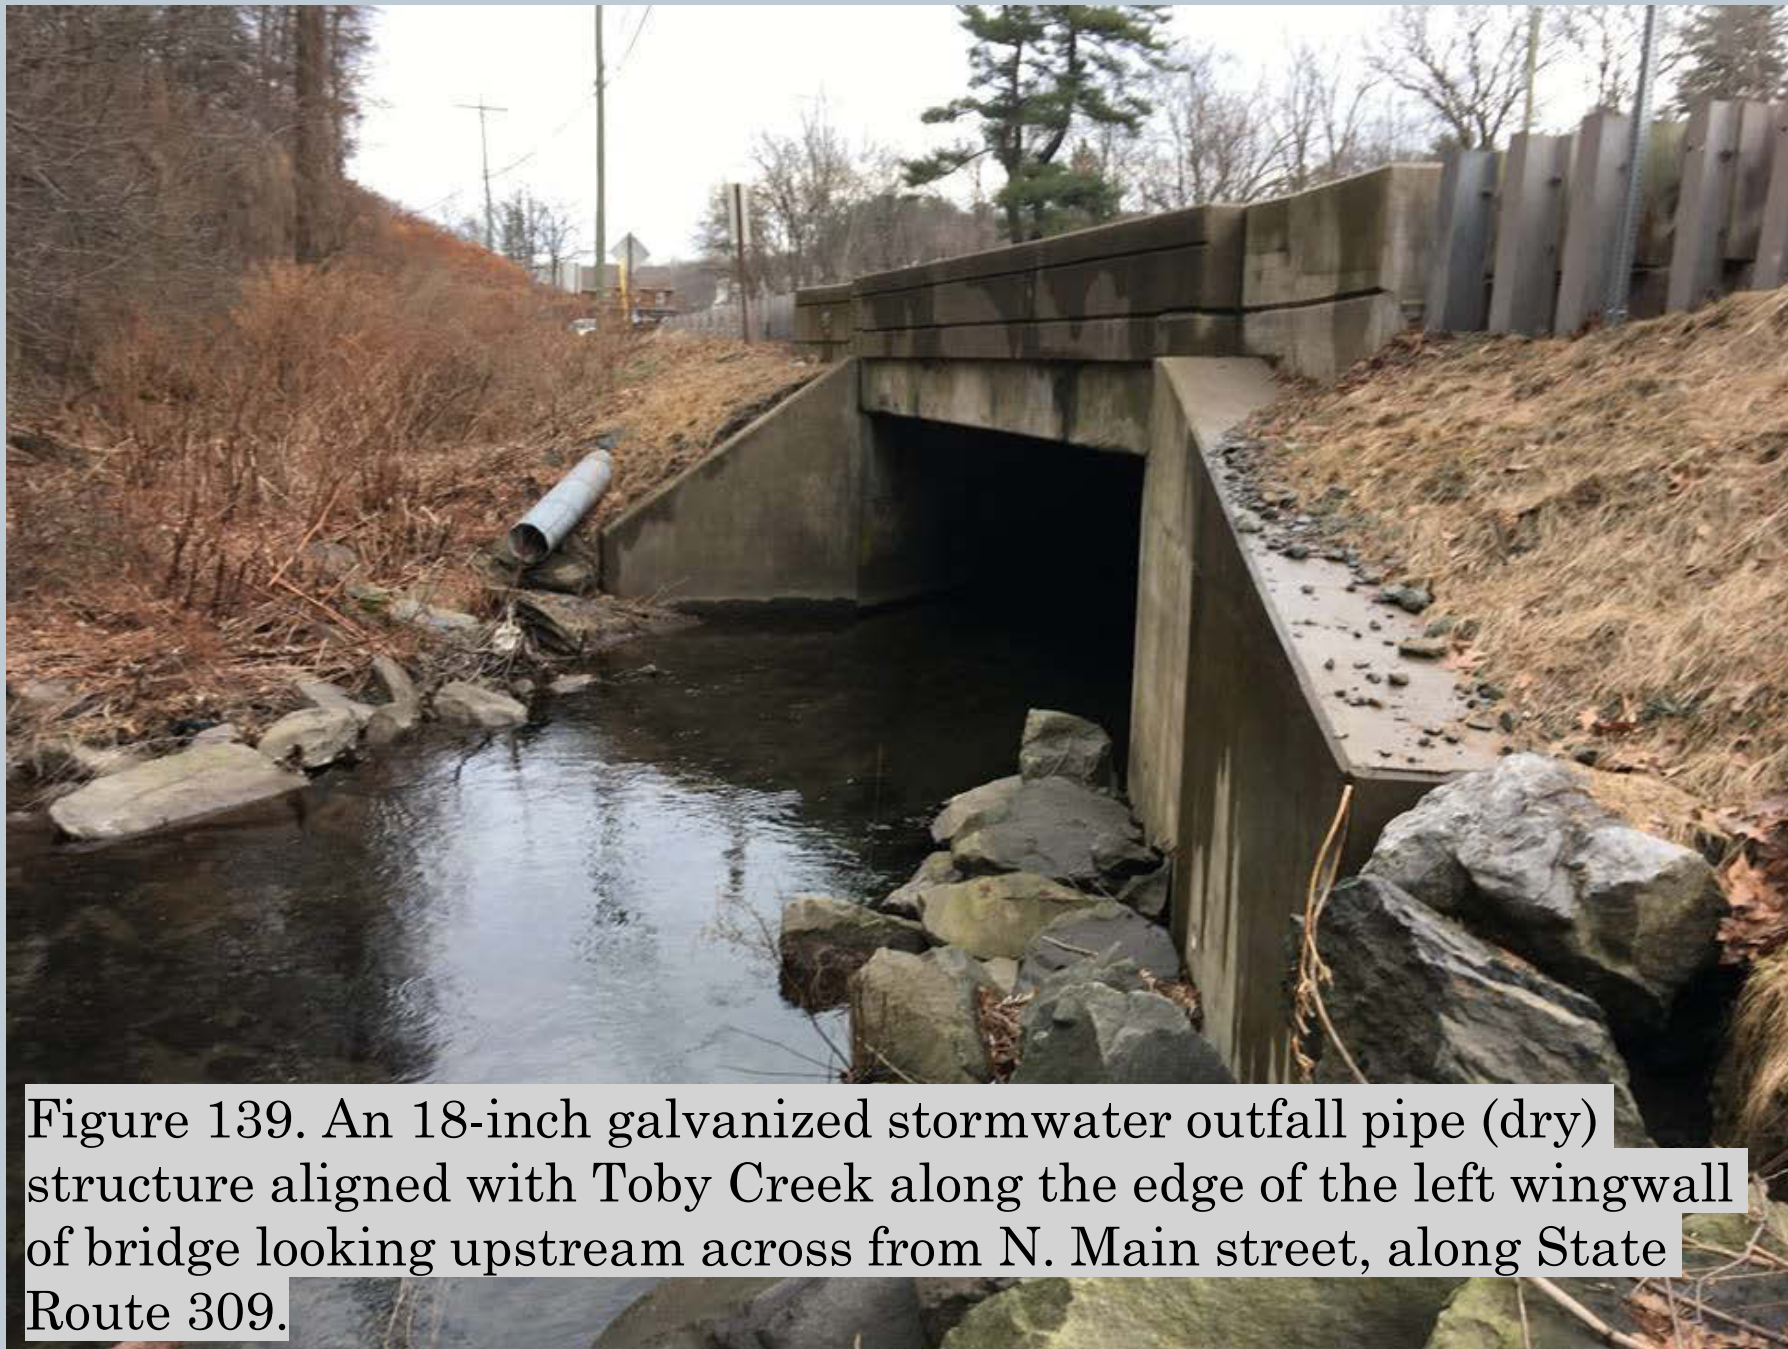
An 18-inch galvanized stormwater outfall pipe (dry) structure aligned with Toby Creek along the edge of the left wingwall of bridge looking upstream across from N. Main street, along State Route 309.
